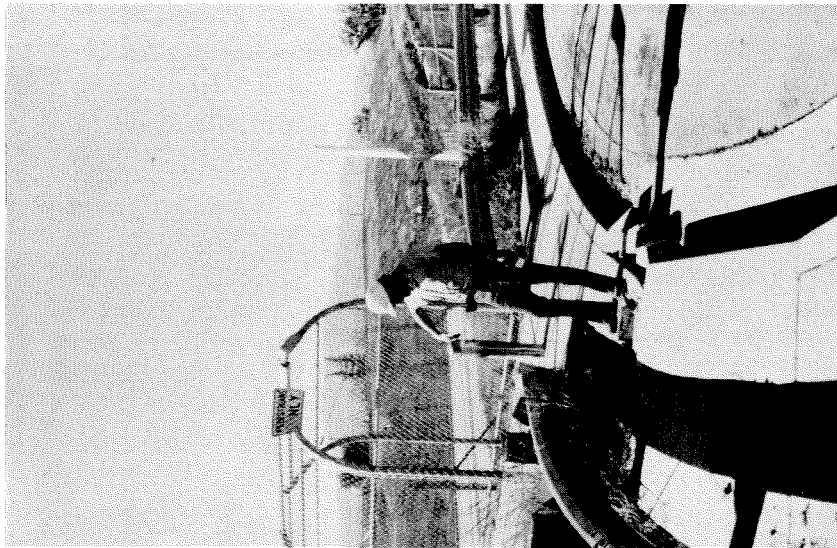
Sidewalk damage caused by abutment pounding, Harding Street footbridge, Foothill freeway.
